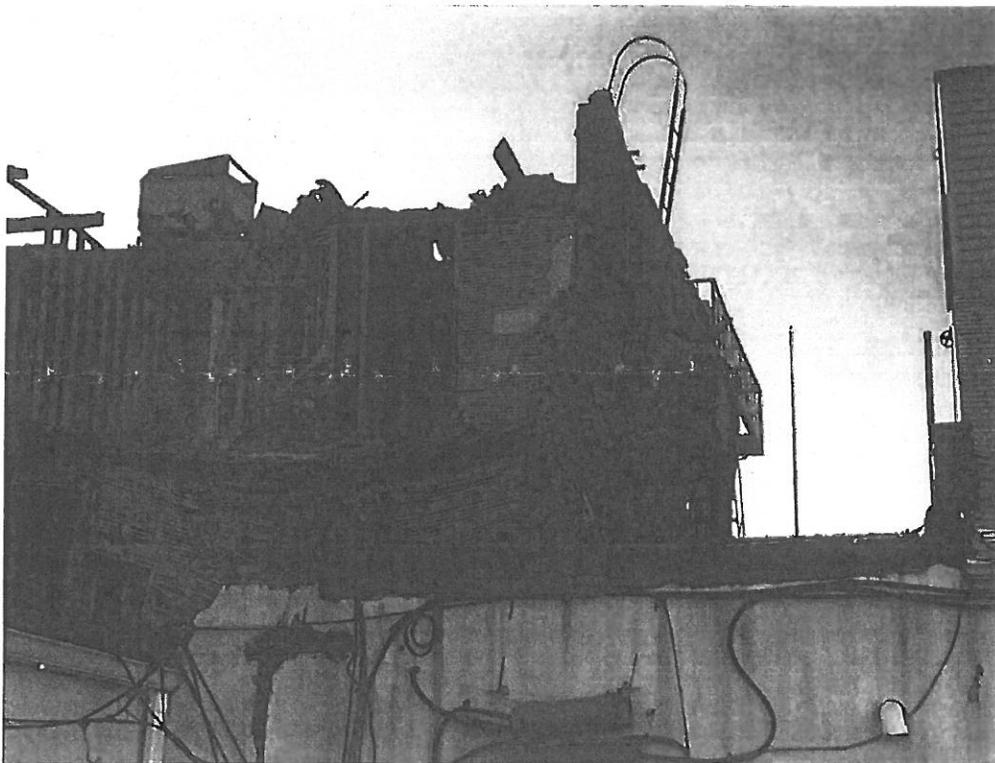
Rear Elevation View of the West (rear) Wall (showing failure and collapse)
